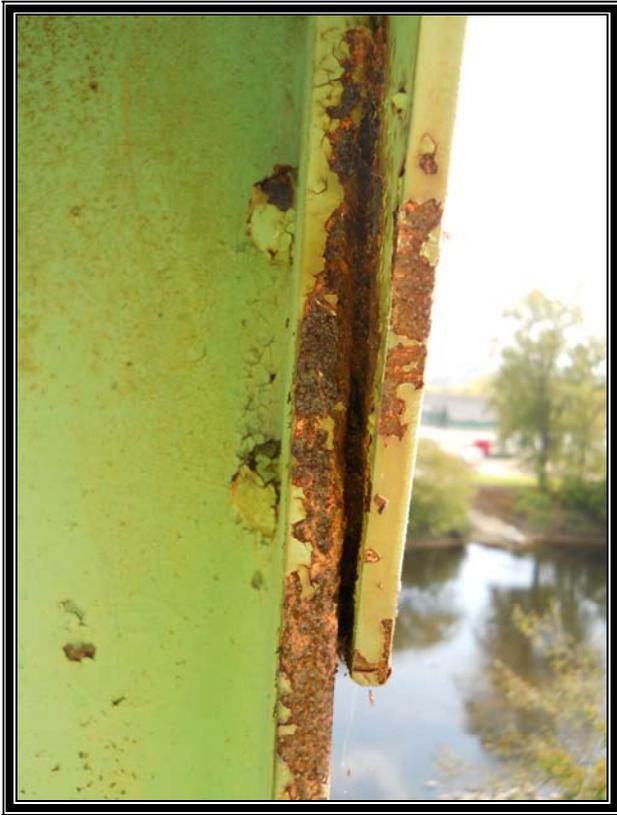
Pack Rust at Span 1 South Truss Gusset Plate U2
